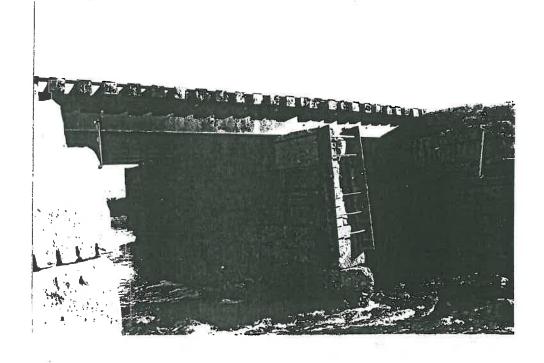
description: Steel stringer bridge over Hampton Falls River (44.24)
